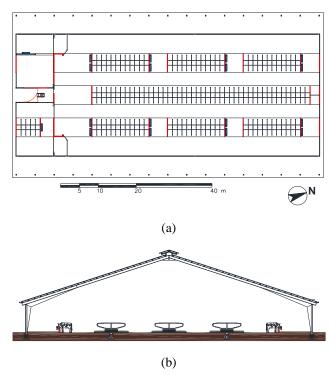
Plan view (a) and transverse cross-section (b) of the case study barn.
